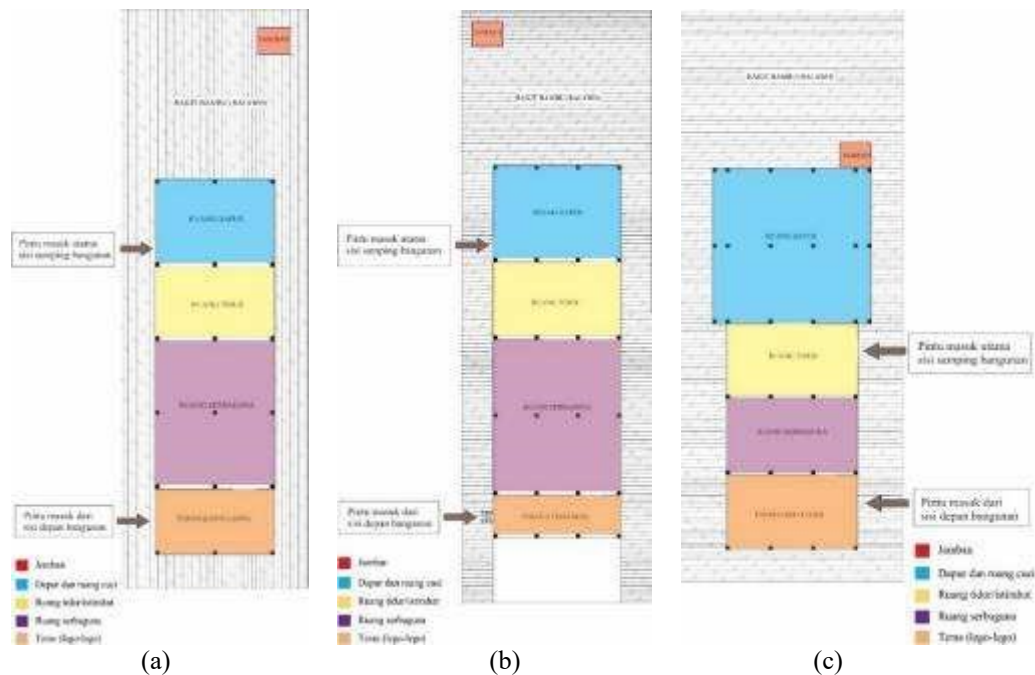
Space Function (a) small house, (b) medium house, (c) large house
